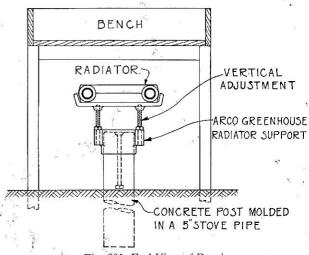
End View of Bench. See also Plan View of Benches, etc., on opposite page.
